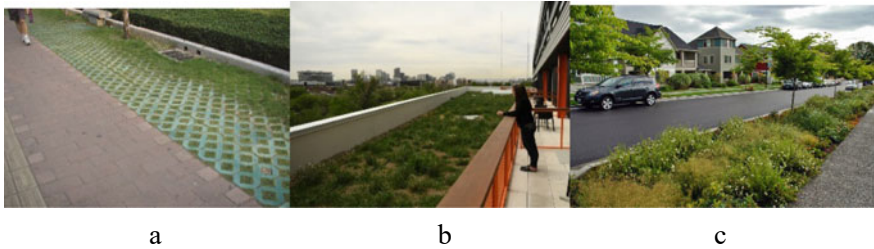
a Pervious pavements. *Source* Adapted from [40], b Green roof at the Flight office building, Denver. *Source* Adapted from [41], c Rain Gardens between a road and sidewalk. *Source* Adapted from [42]
